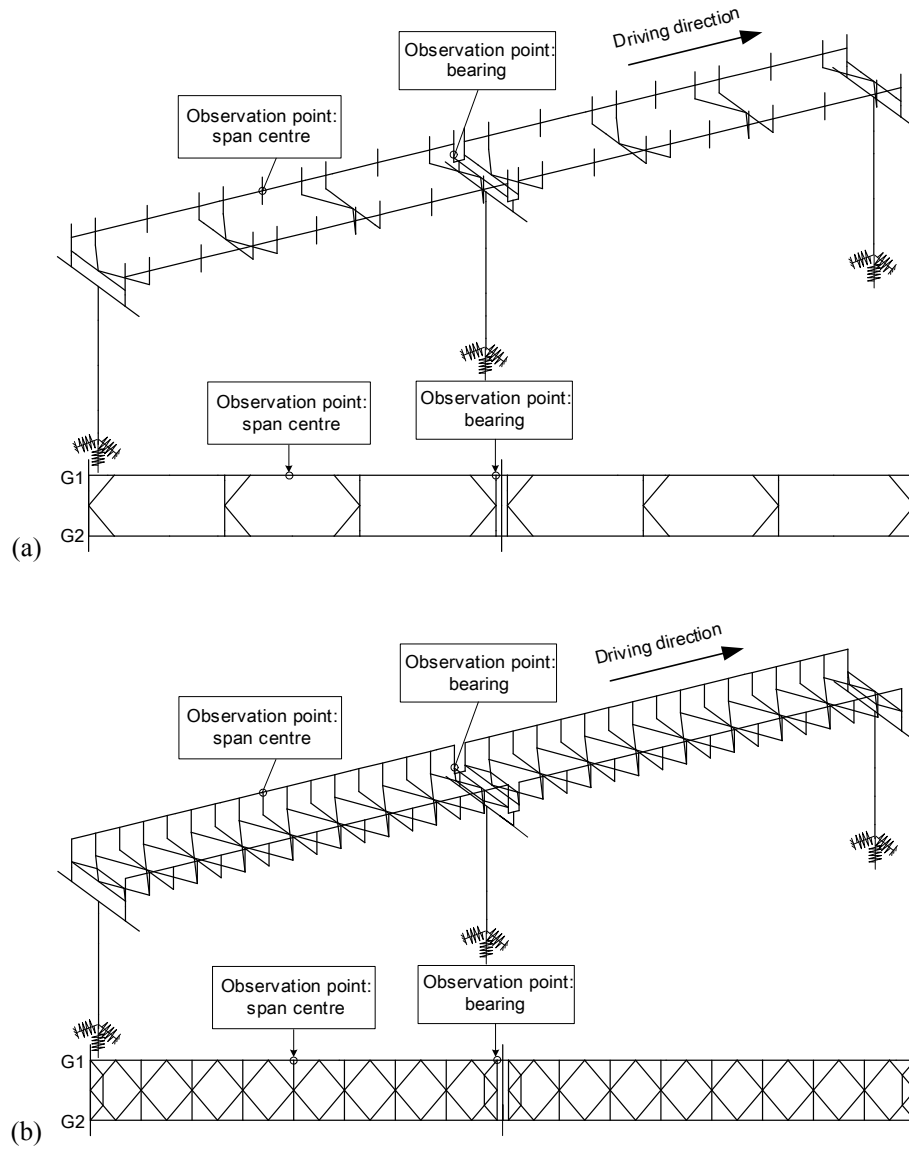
FE models of monorail bridges: (a) advanced bridge; and (b) conventional bridge.
